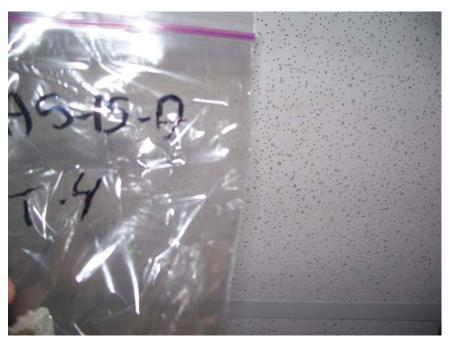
CT2 ceiling tile (non-asbestos)
